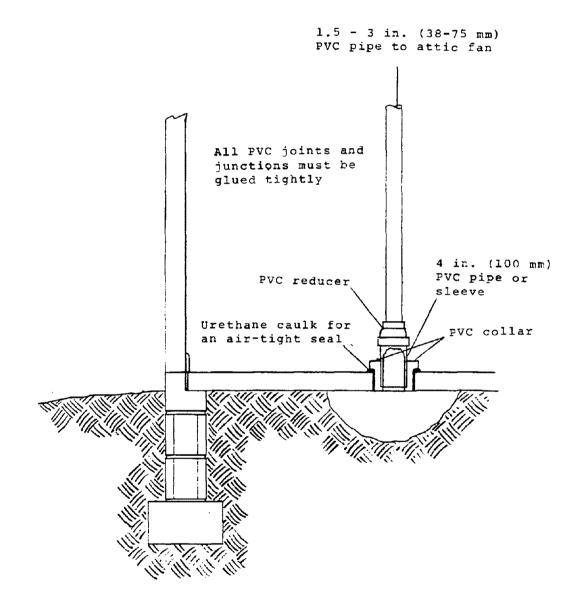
Illustration of a typical interior suction point showing the 4-5 in. (100-125 mm) hole drilled through the slab, the 12-20 gallon (0.05-0.09 m³) pit excavated under the slab, and a sampling of PVC collars, sleeves, reducers, etc. leading to the exhaust pipe going into the attic.
